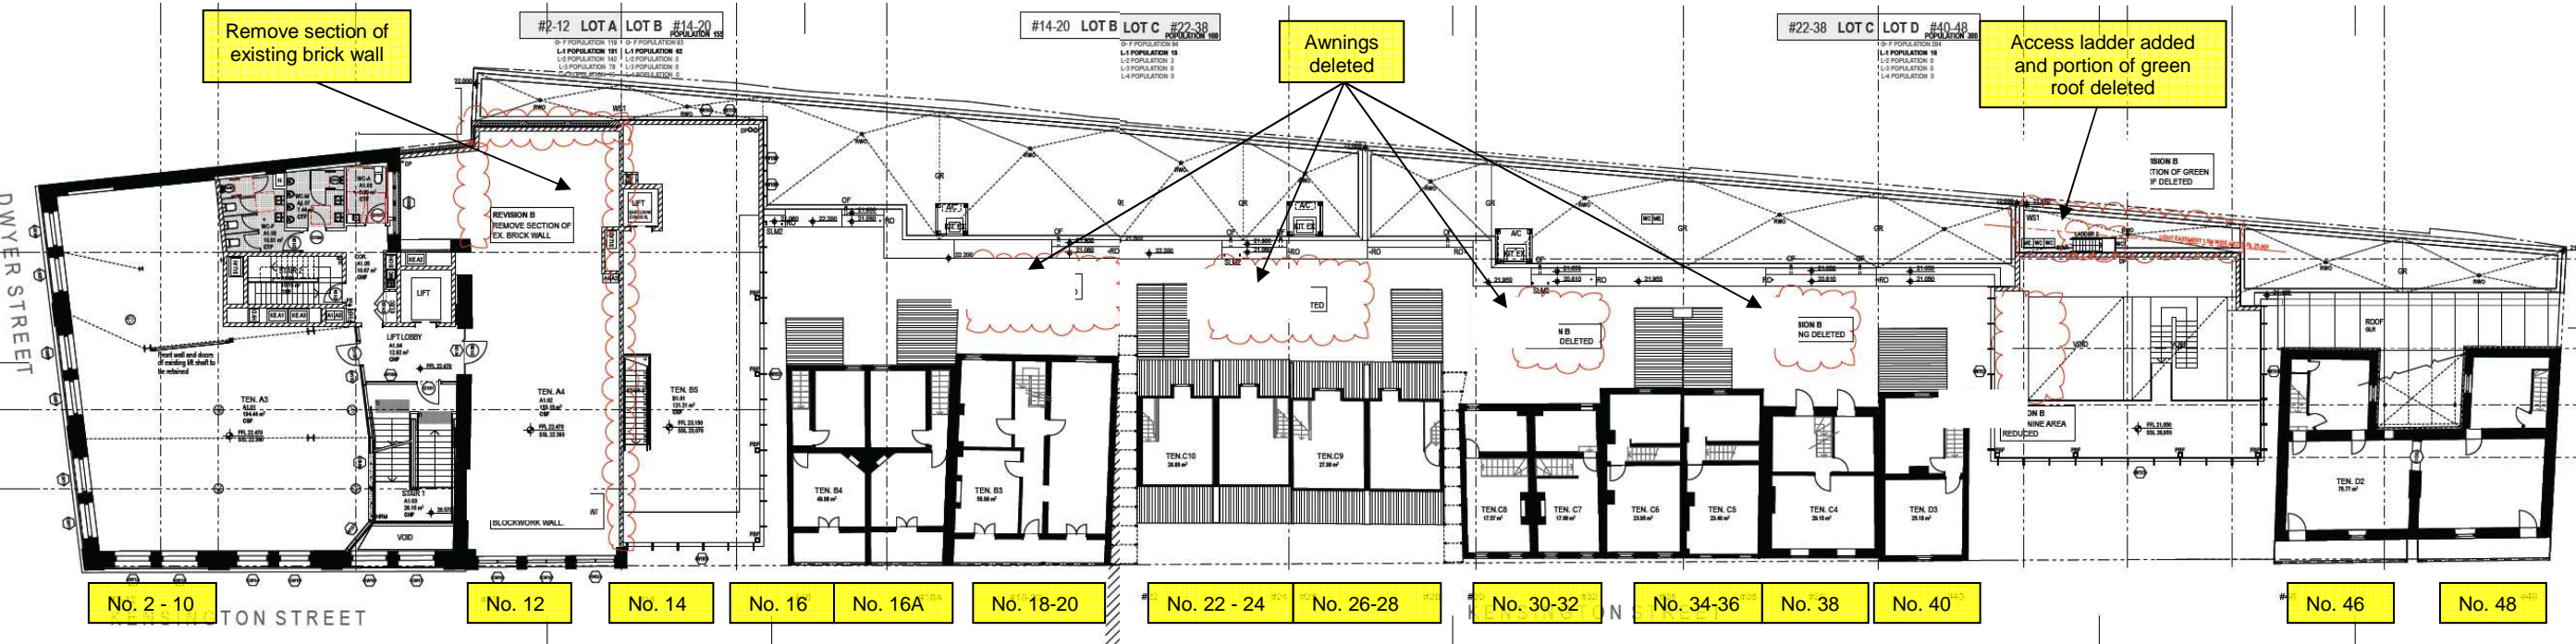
Proposed amendments to first floor of development (Source: Architectural plans from Proponent's Application)
